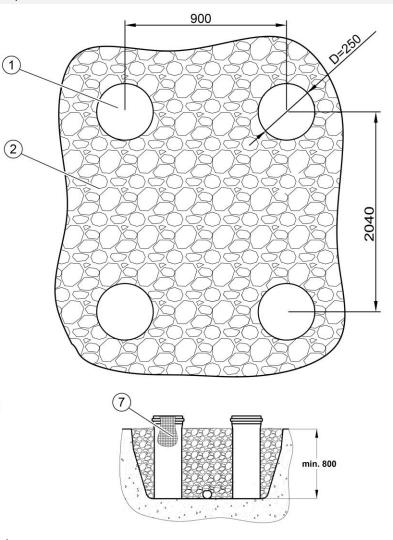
Strip foundation for VHS 80 evaporator (in mm)
